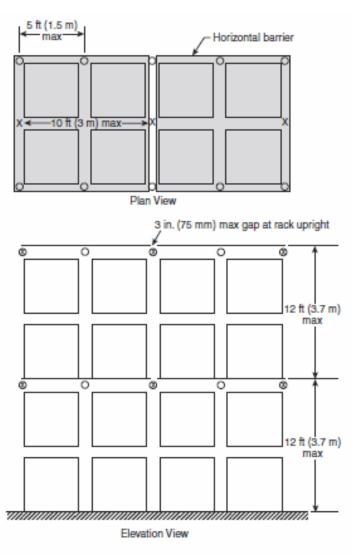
(A) Alternative Protection for Double-Row Racks.
